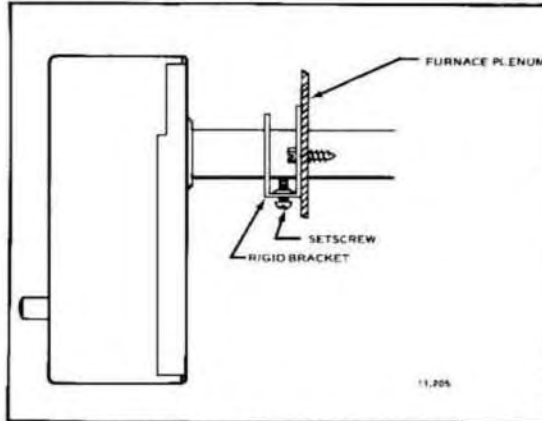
RIGID BRACKET MOUNTING REQUIRES A HOLE 13/16 in. [20.6 mm] DIAMETER FOR ELEMENT INSERTION.
